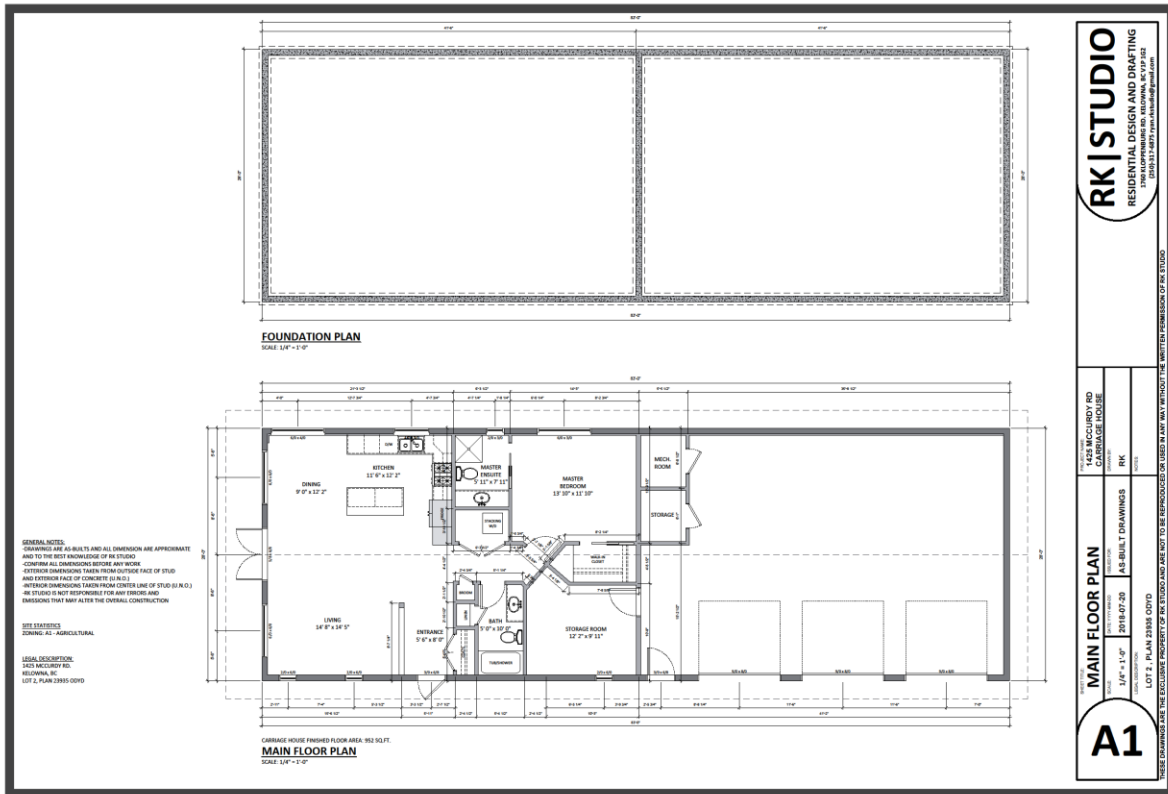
Tentative floor plan of non-farm use building. Access to storage area will be from both the suite and the garage.
